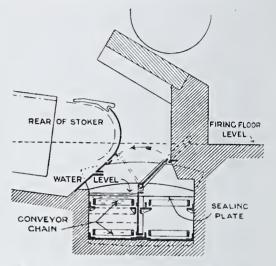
The Usco Ash Conveyor as arranged in a Boiler Setting.
